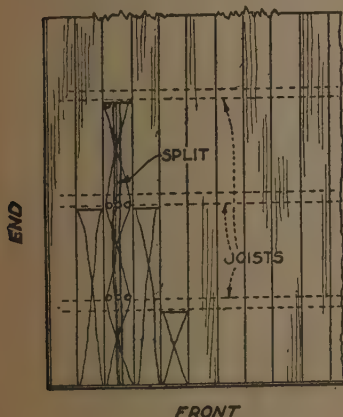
The first piece of flooring is removed by boring, sawing and splitting; the other pieces are merely cut out.
